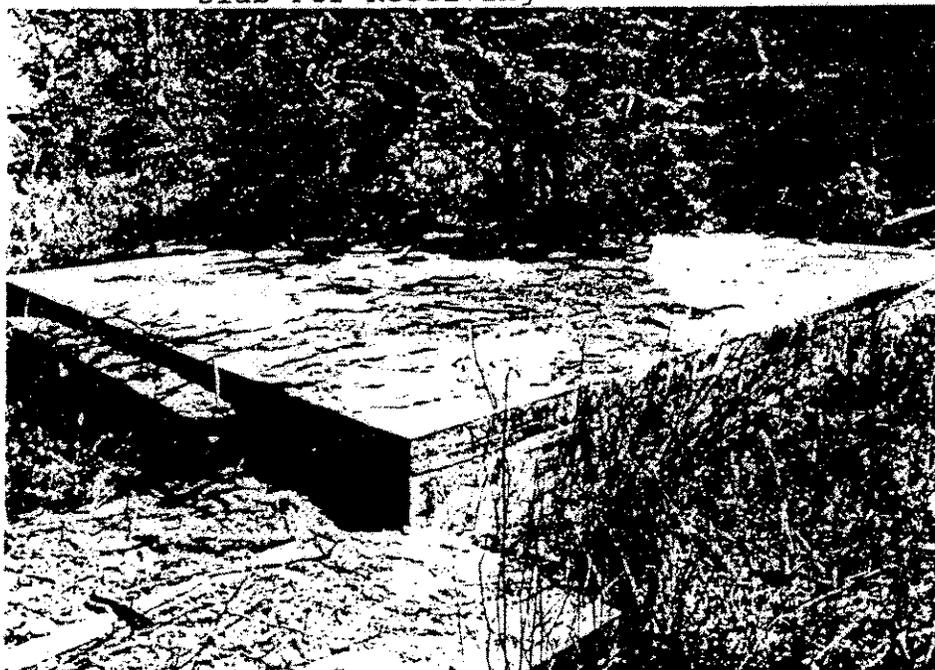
Raised Concrete Floor With Multiple Adjoining Slabs and a Wooden Plank.
